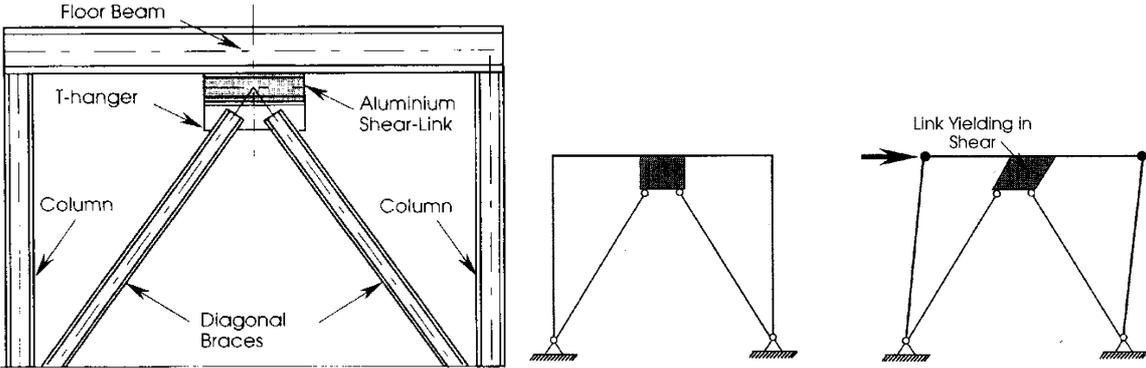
Schematic diagram and typical collapse mechanism of the SLBF system
